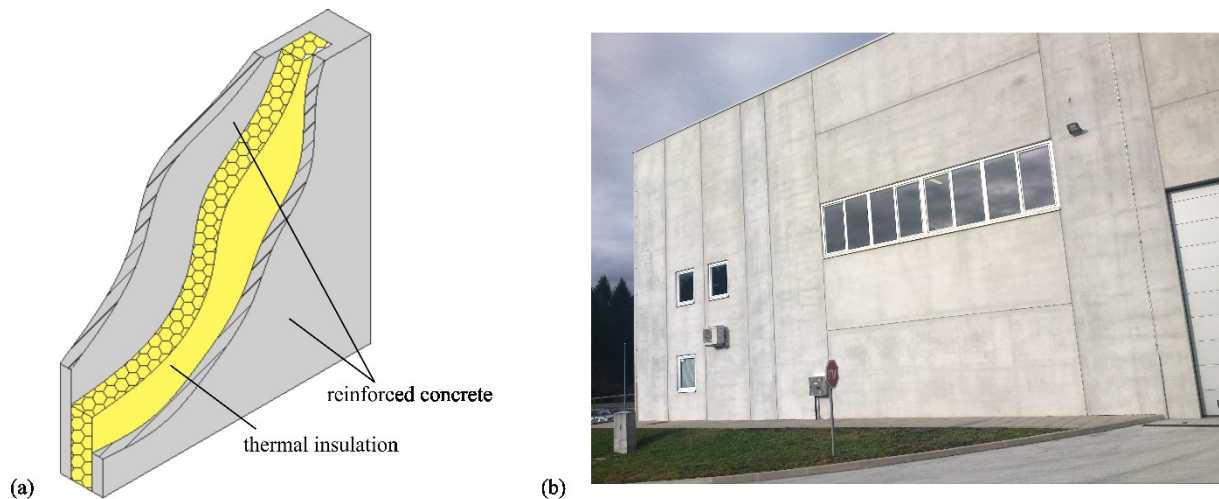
RC façade panels: (a) typical precast façade panel scheme with thermal insulation between the concrete layers and (b) a building with vertical and horizontal panels
